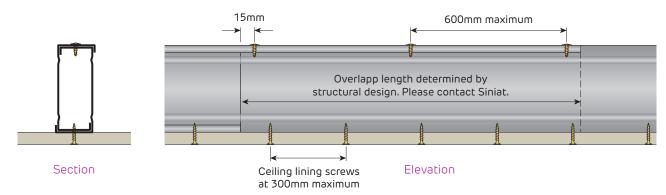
Splicing Steel Ceiling Studs via Overlap Method
